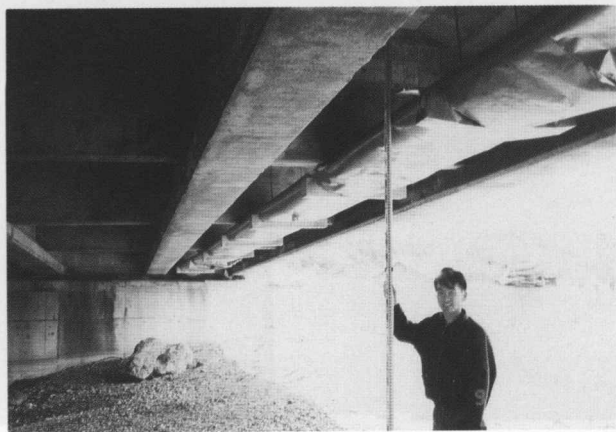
Deformation of steel plate covers of water supply pipe underneath, as caused by tsunami (concrete girder bridge, Shimamaki)
